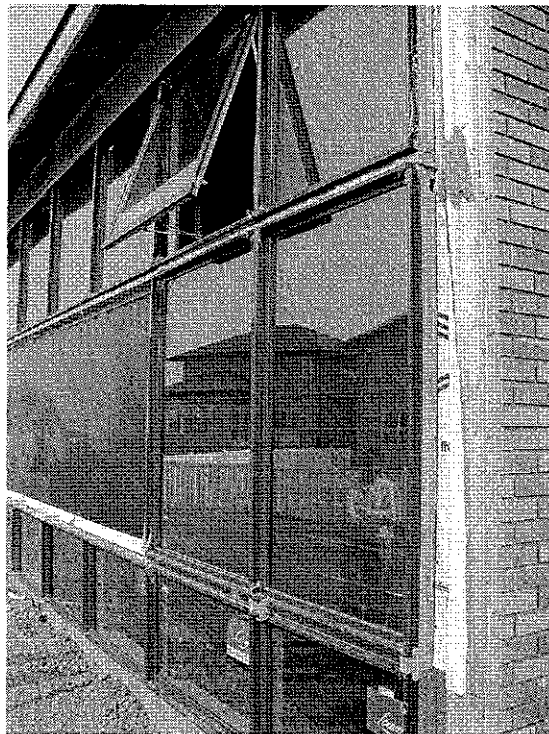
Integration of the solar thermal panels with the windows on the south side of the house. The solar thermal panels are in a 5 foot tall horizontal band between the upper windows on the main floor and the basement windows.
